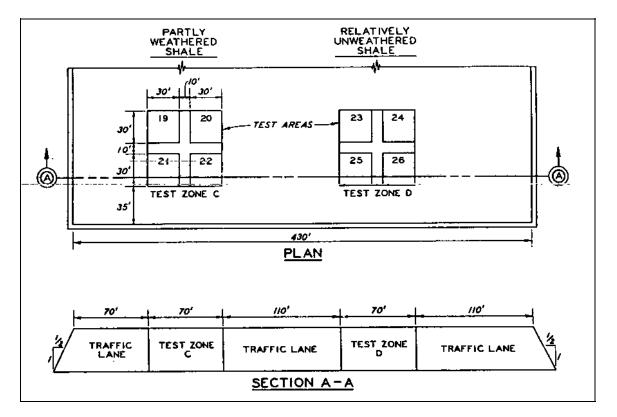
Beltzville Dam, plan and profile of the test fill
